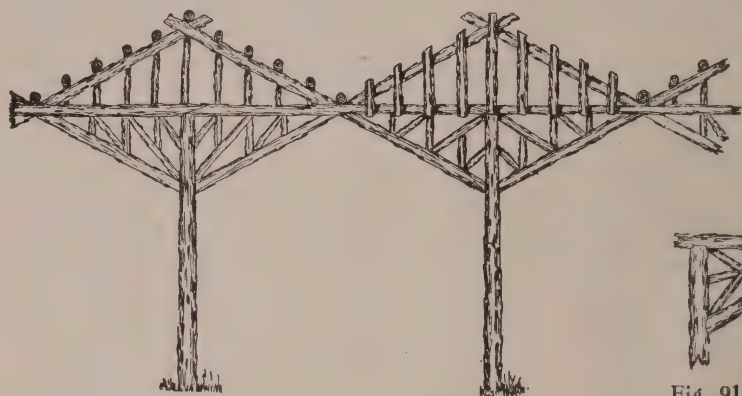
Alternative Design of Promenade Pergola with Alternated Roof
